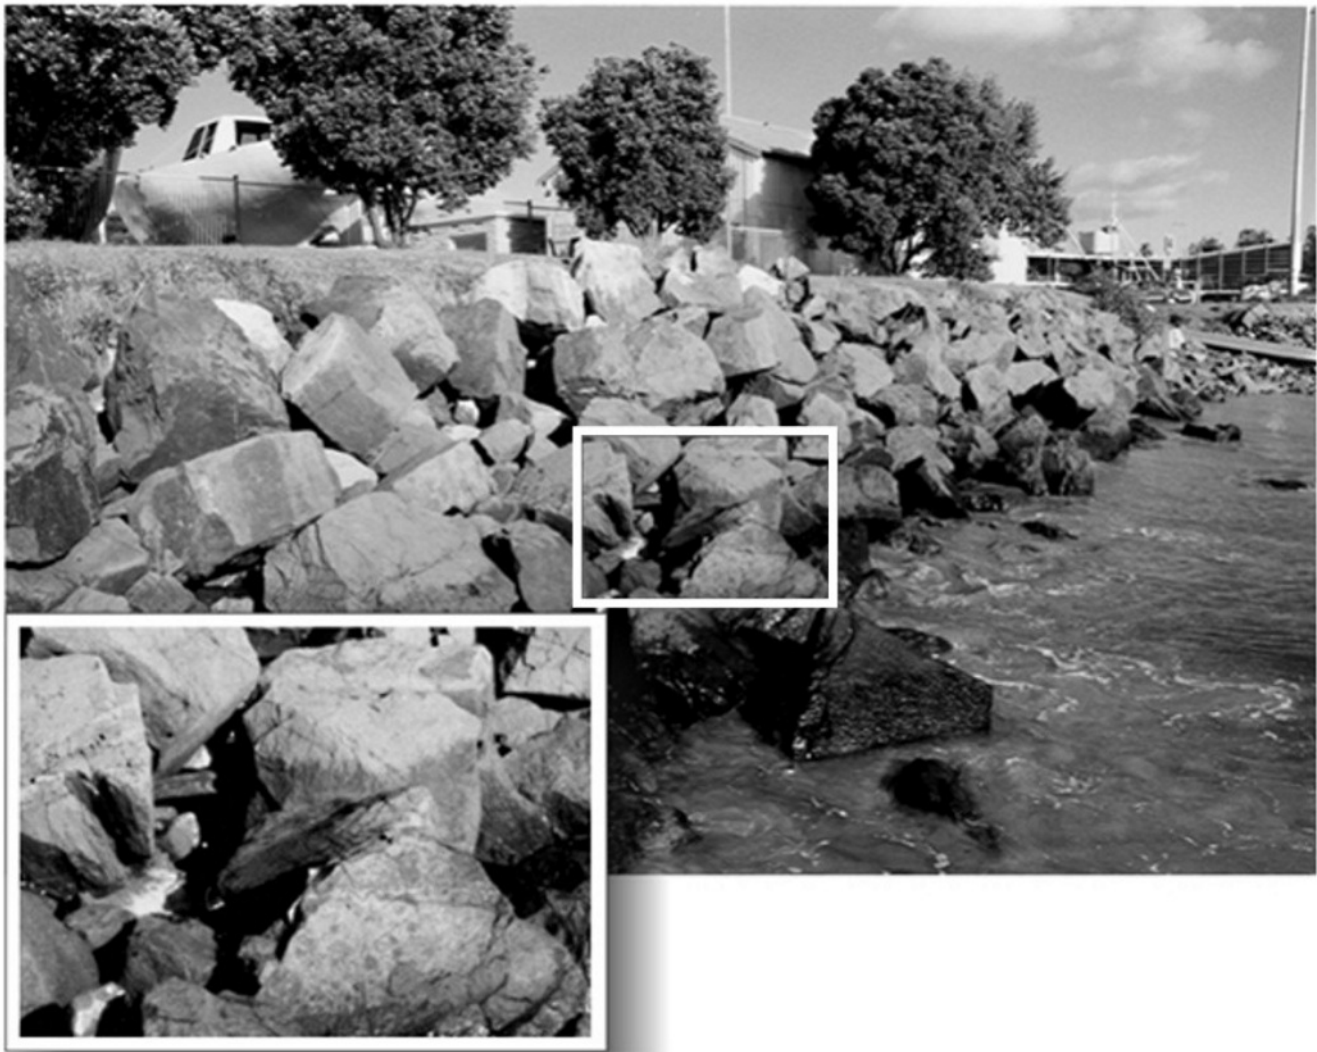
The rock wall rebuilt after a severe storm destroyed the seawall. The sections of rail line remain under the rocks (looking south-west).
